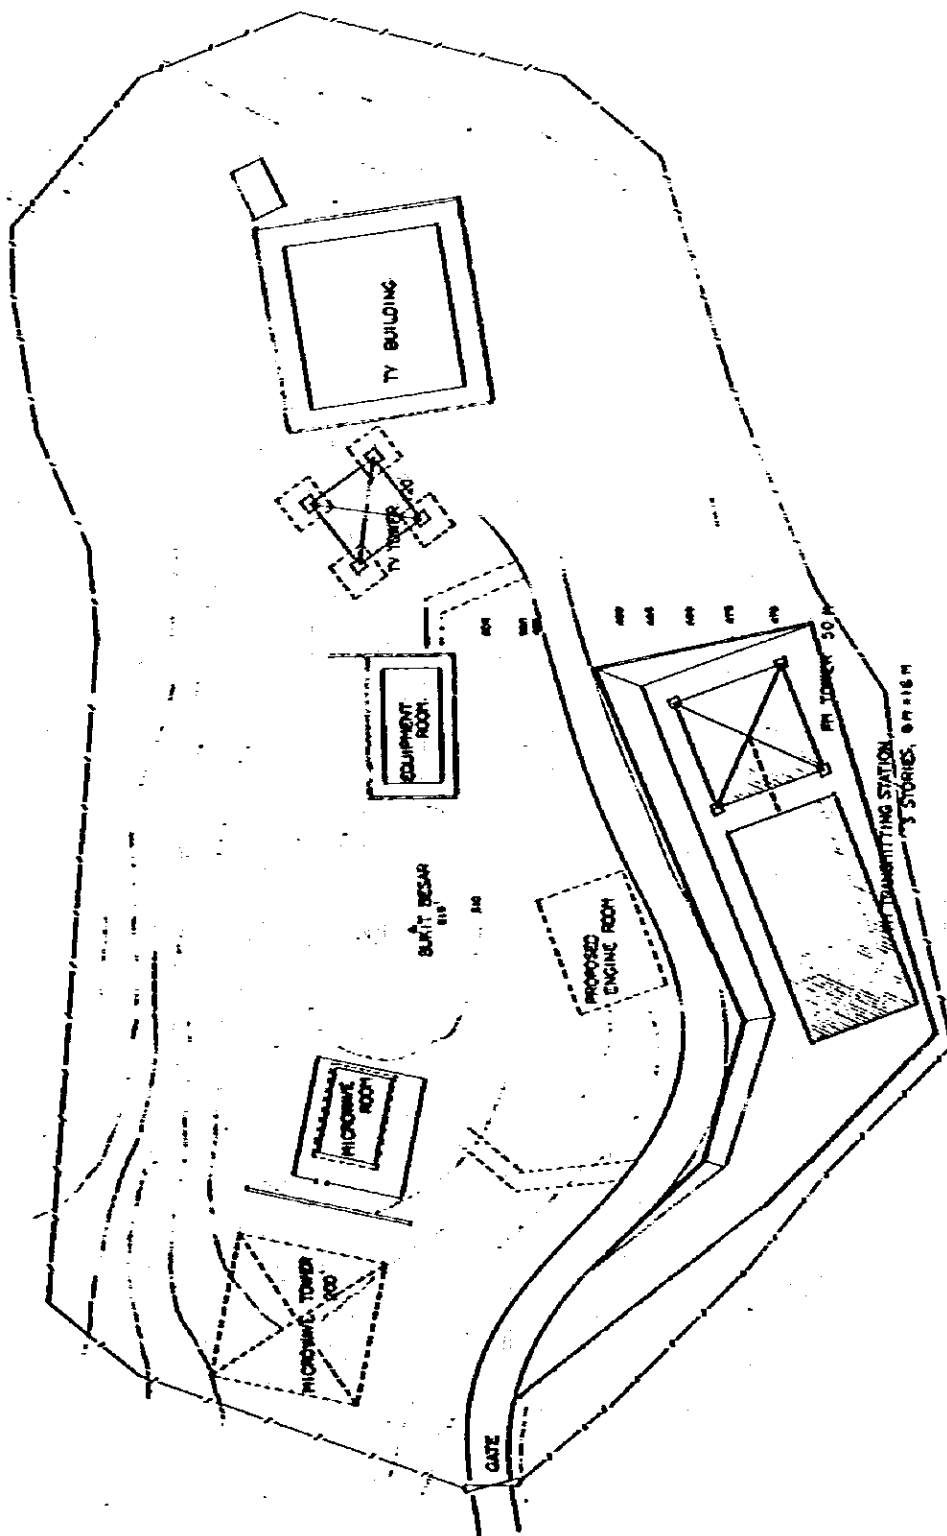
Site Plan - Bt. Besar, K. Trengganu
